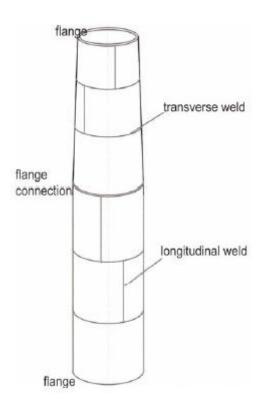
⁷⁵ - Welded tubular steel tower.
